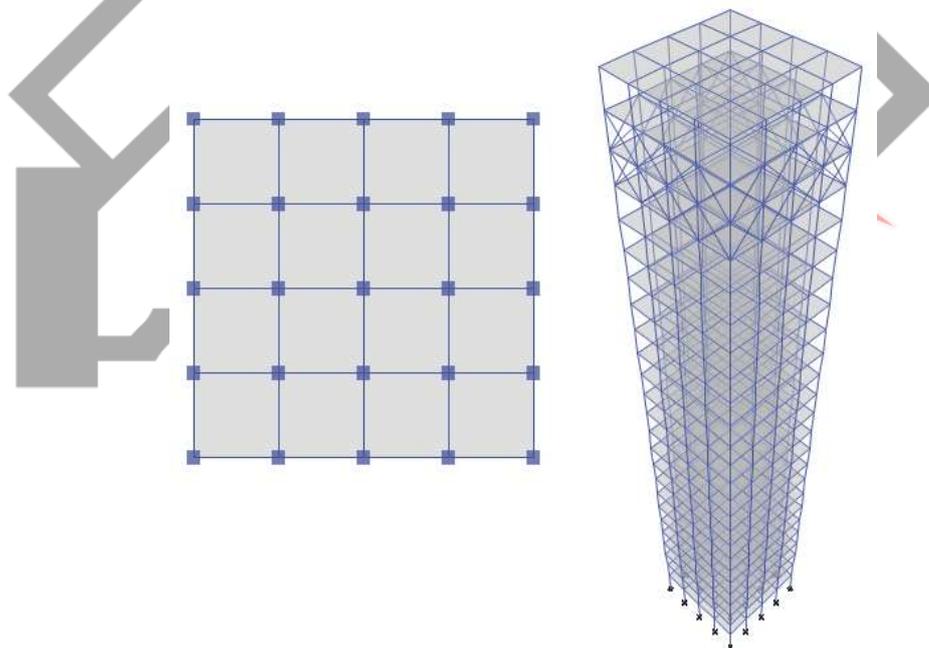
Building with External X Brace at 23rd & 24th Storey (Model II)
